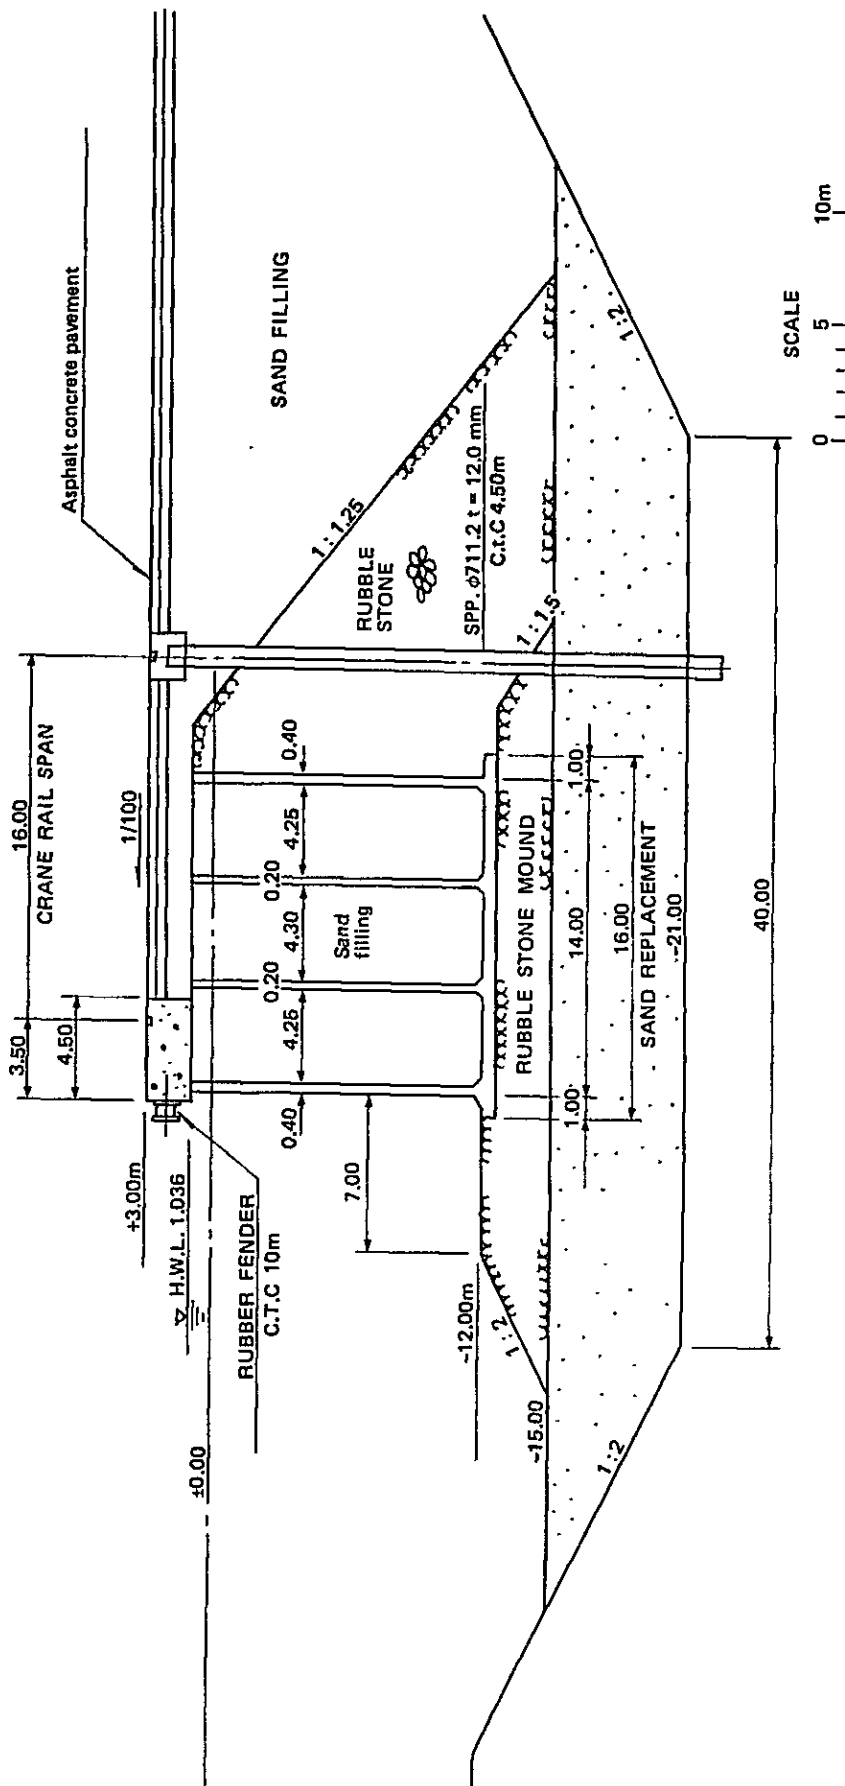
Container Berth Quaywall (Concrete Caisson Type)
